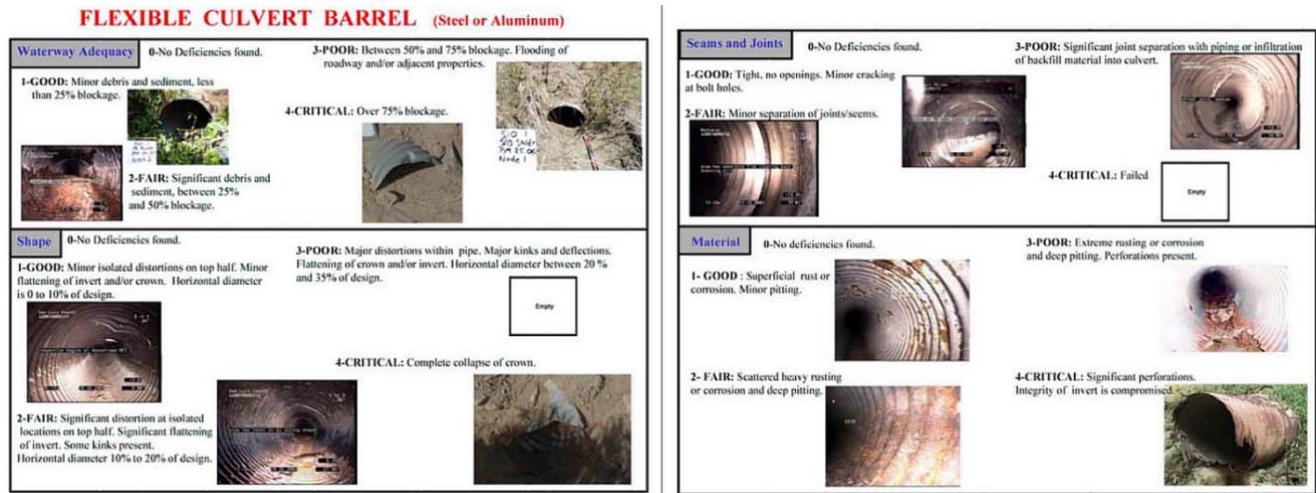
Caltrans criteria for condition rating of corrugated metal culvert barrel (Caltrans, 2003).
